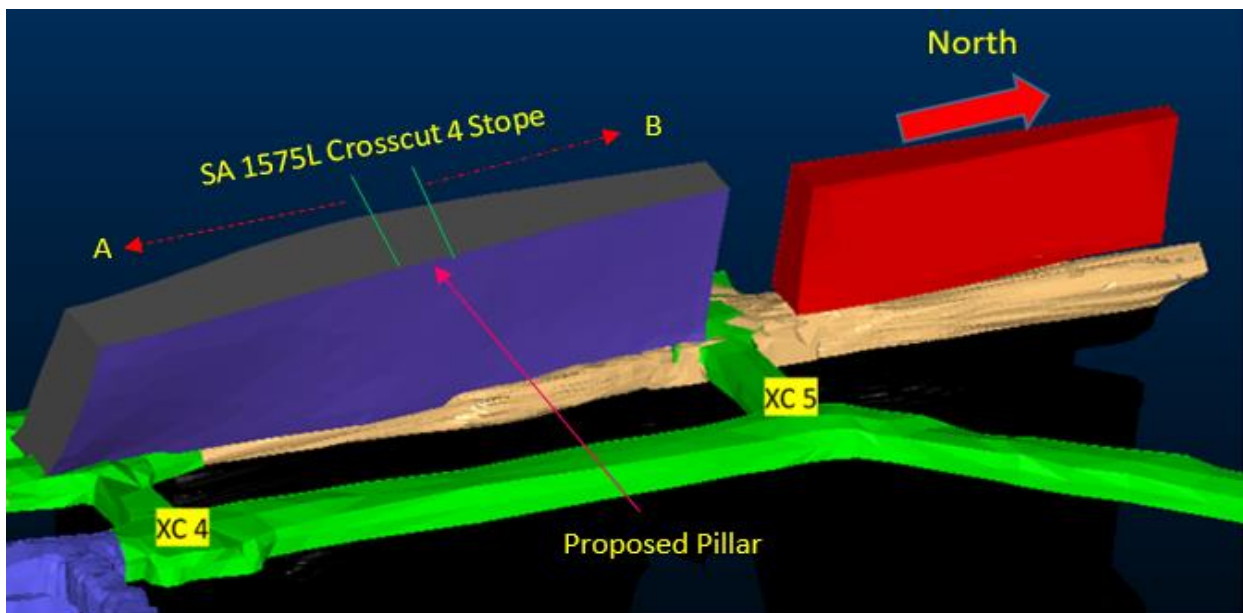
Longitudinal Section of the SA 1575 Cross Cut 4 North Crown Pillar Stope
